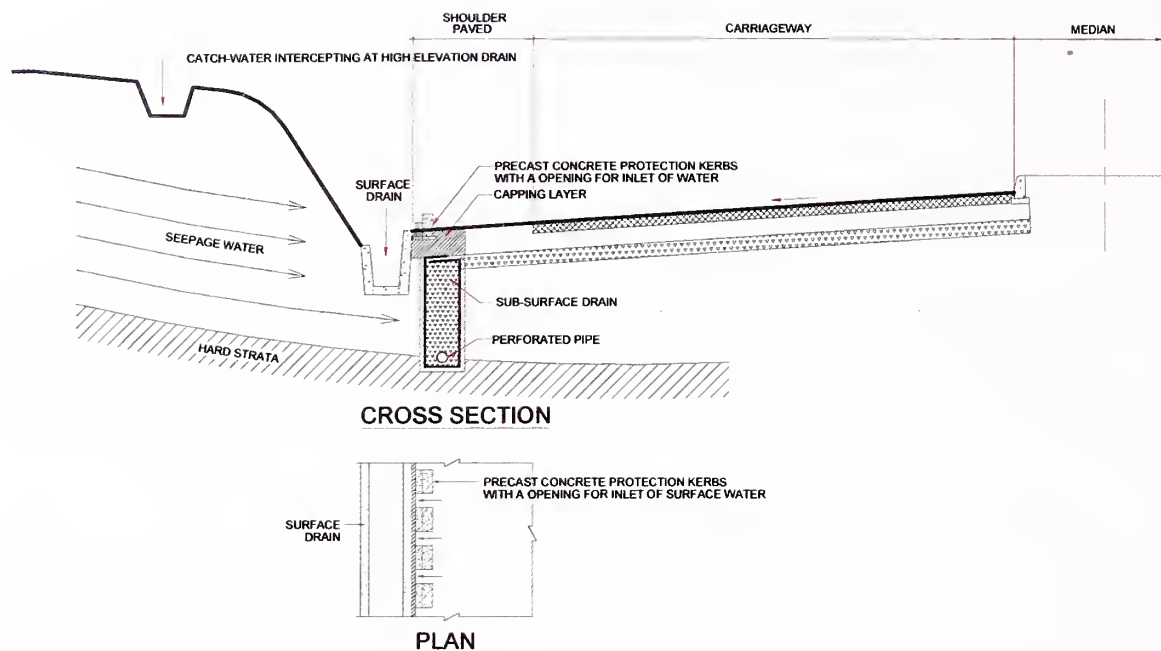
A Sketch Showing an Arrangement to Intercept Seepage Water in a Cut Section in Hill with a Subsurface Drain. Drainage of Surface Water is Taken Care of by Side Drains
